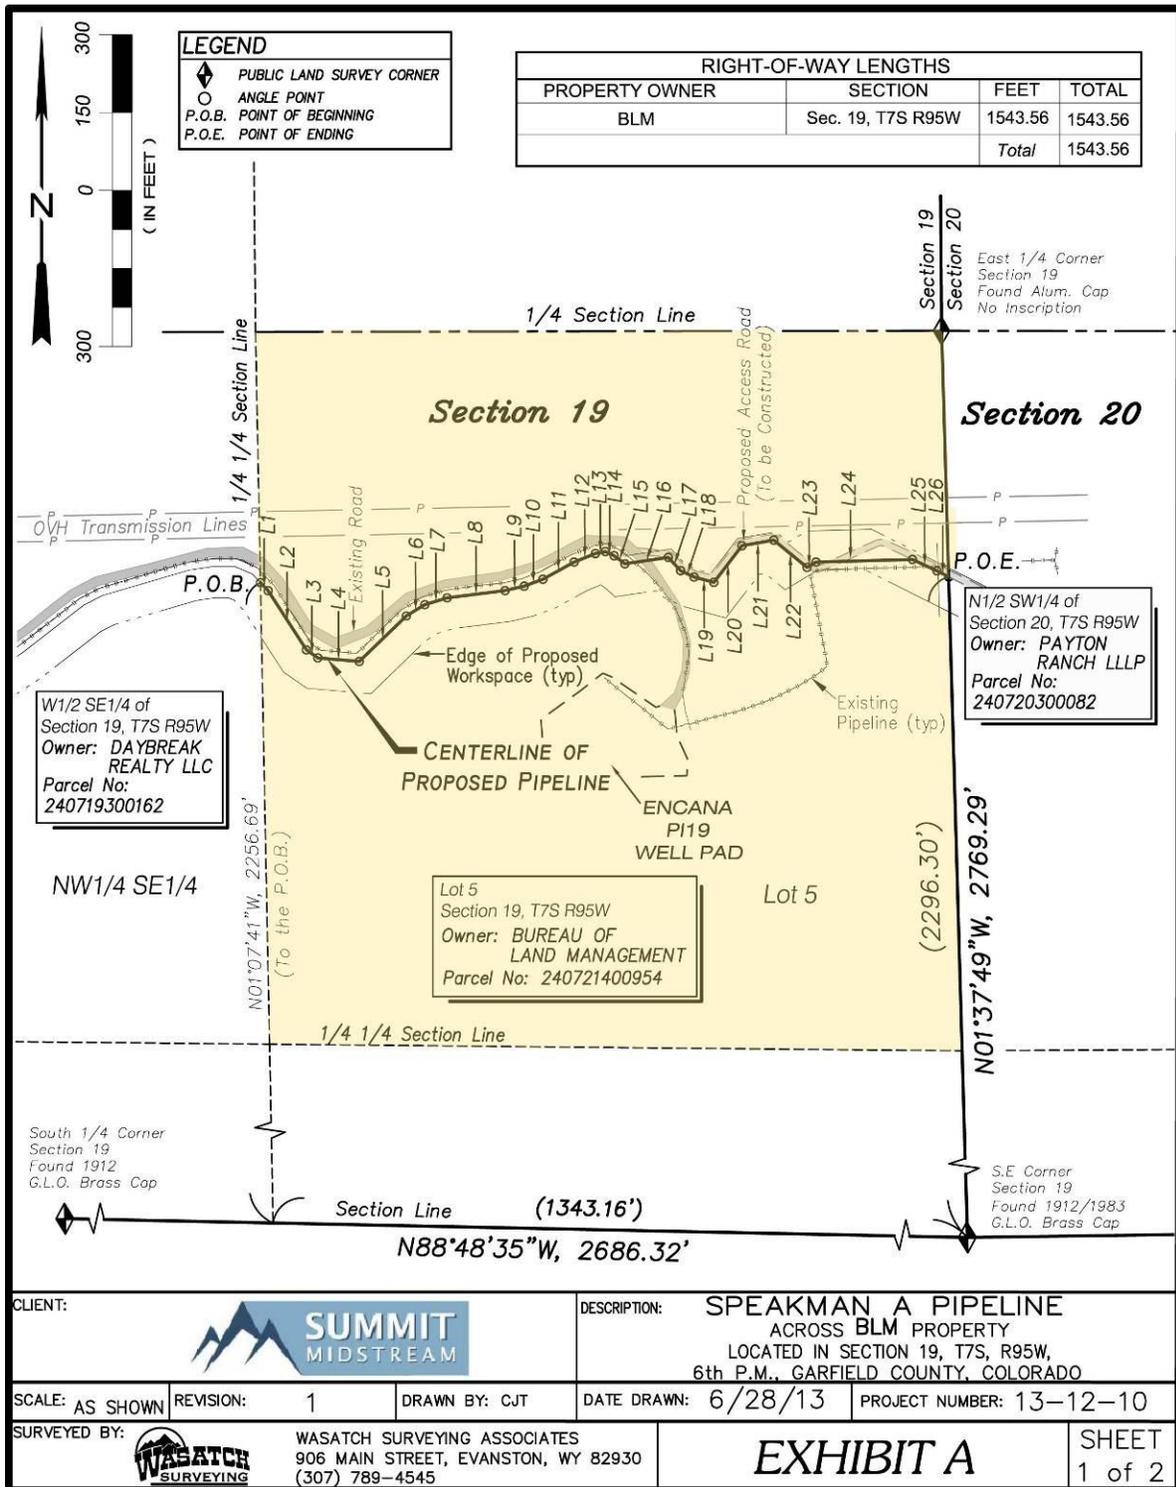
Pipeline and Access Road Plan on BLM (Section 19)
